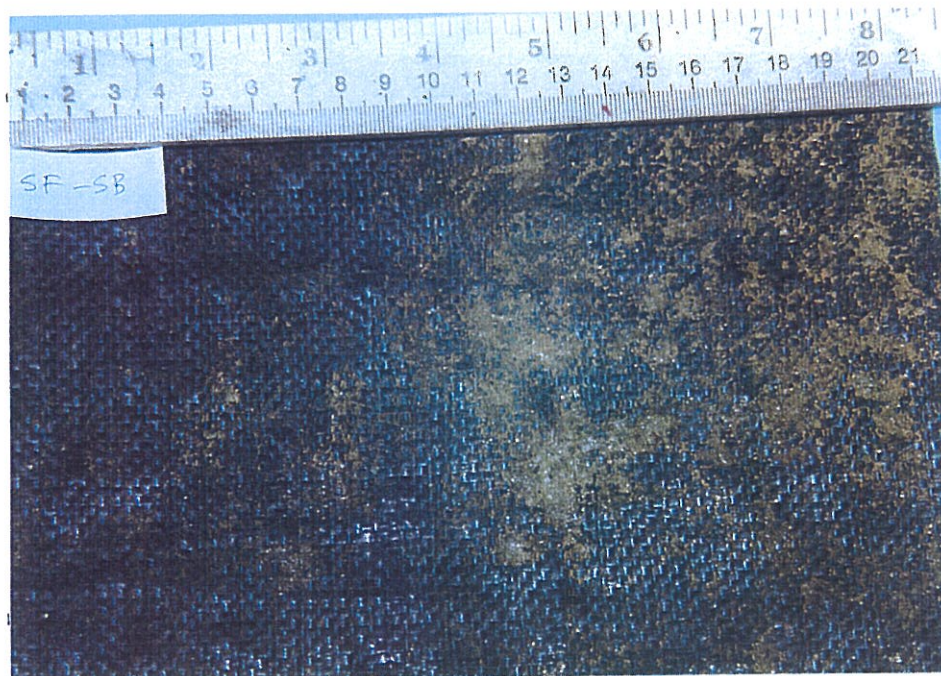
Bottom of SF-SB geotextile, laboratory photograph showing blinding.
